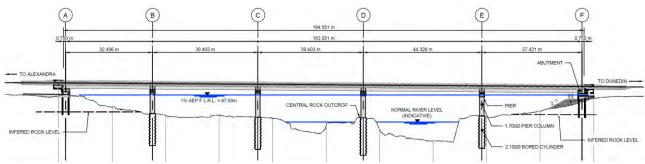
Structural long section of the proposed bridge viewed from downstream
